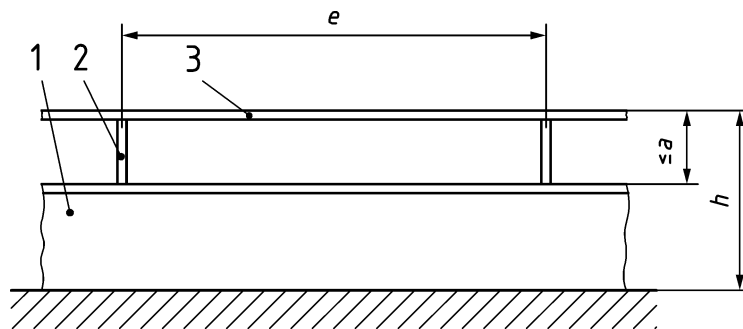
Sample design of a railing in the transition to the bulwark — working areas
